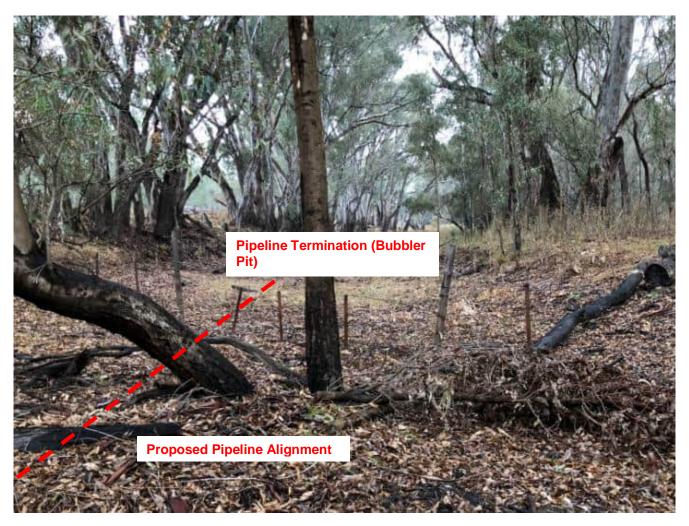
Proposed Termination of Pipeline in Sunday Creek (looking south-east at RD 330 m)
